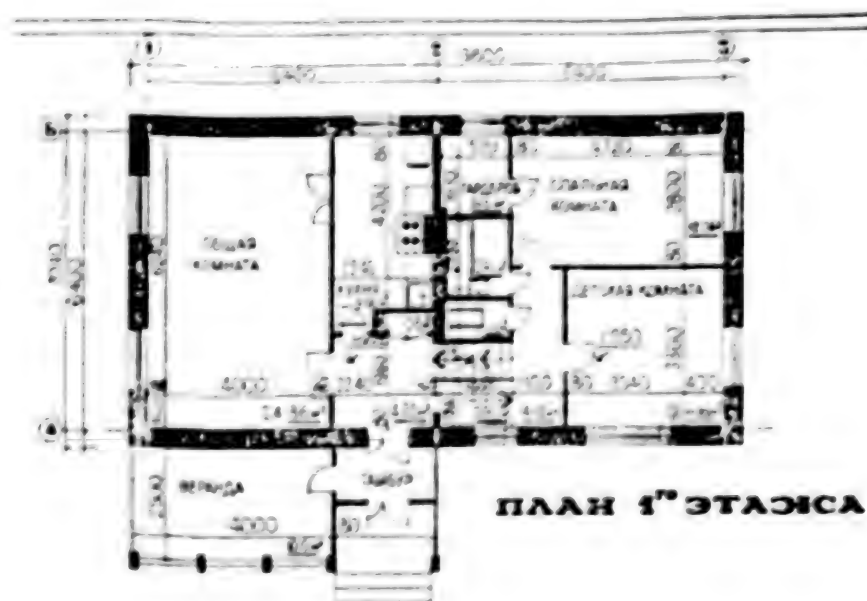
Draft Plan of House Made of Series 25 Structural Components
